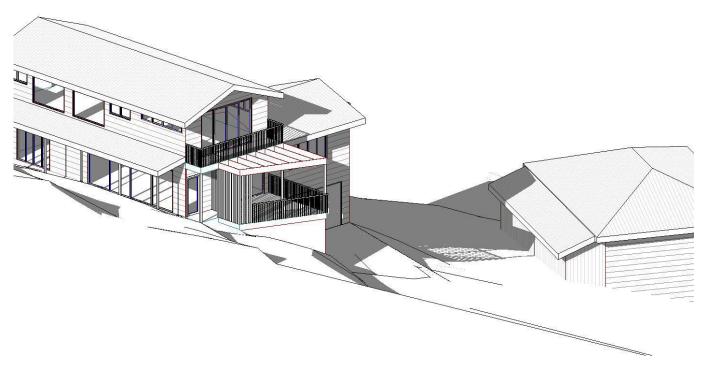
Parametric shadow details, viewing south - 21 June, 10am
